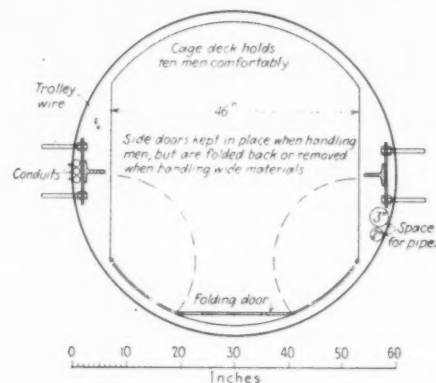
CROSS SECTION OF THE COMPLETED SHAFT SHOWING CAGE OUTLINE, PIPE LINES, AND CONDUITS
